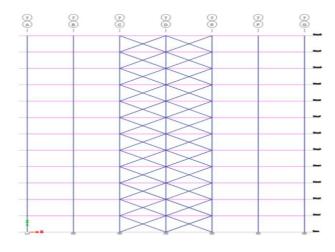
Flat slab with bracing having(G+12) story building (Plan View)
